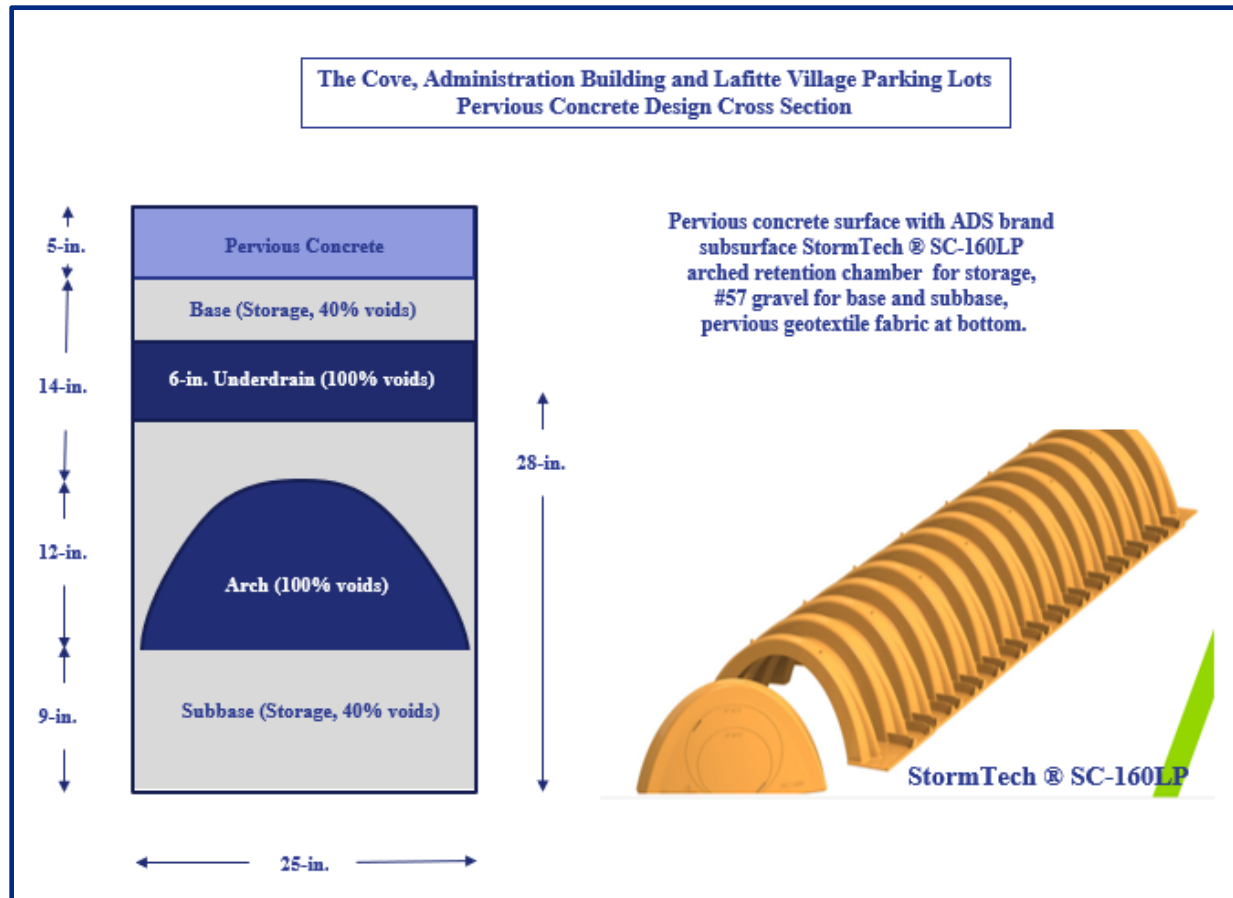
Pervious pavement design and StormTech SC-160LP detention arches.
